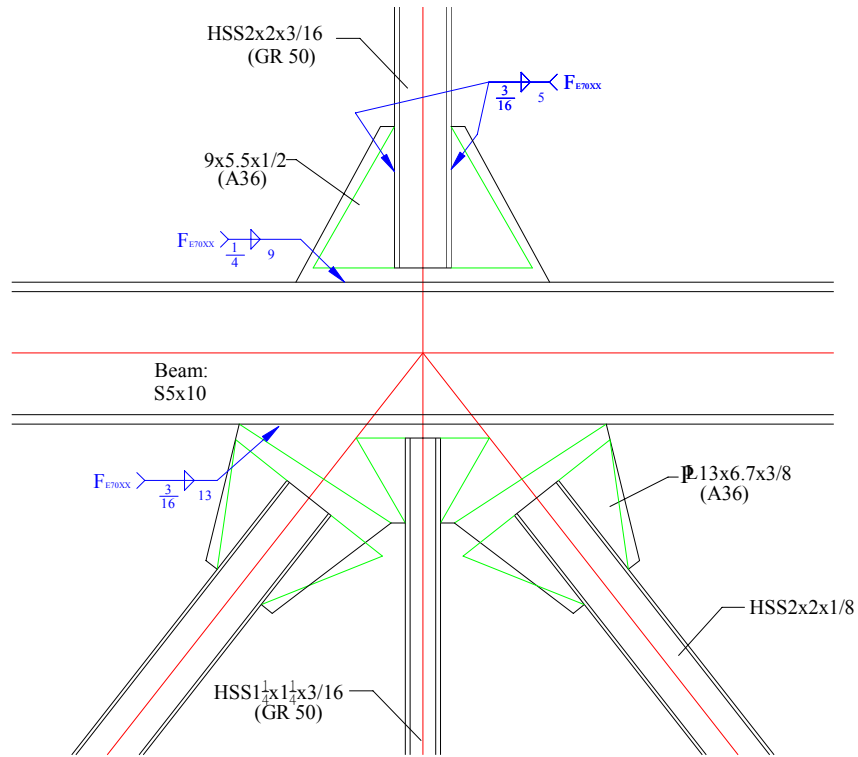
Details of the 3rd-floor brace-to-beam and zipper strut-to-beam connections.
